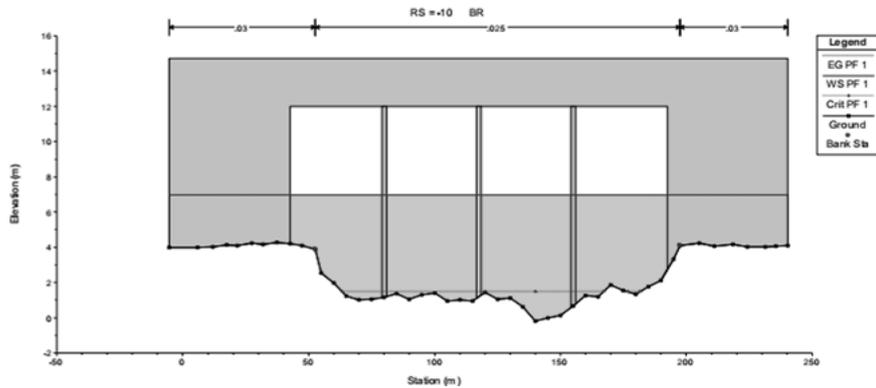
Cross section showing the flood level at the bridge location for a design discharge.
